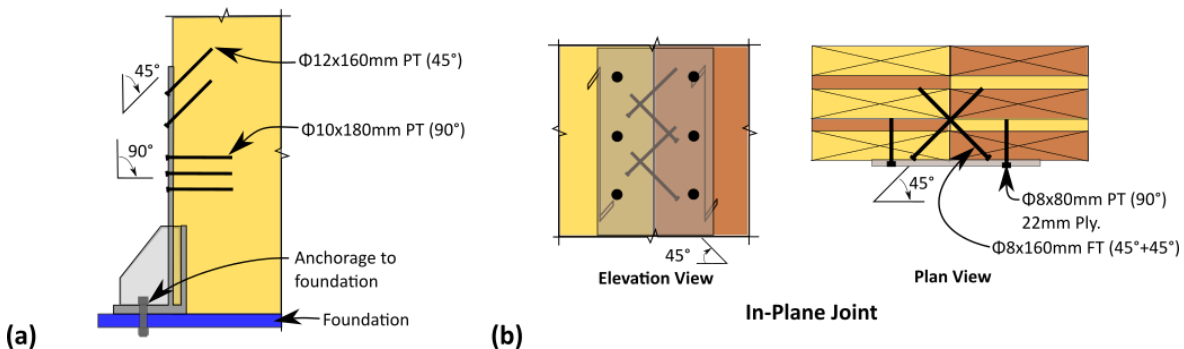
Conventional core-wall test key details: (a) mixed angle STS hold-down (b) in-plane joint
